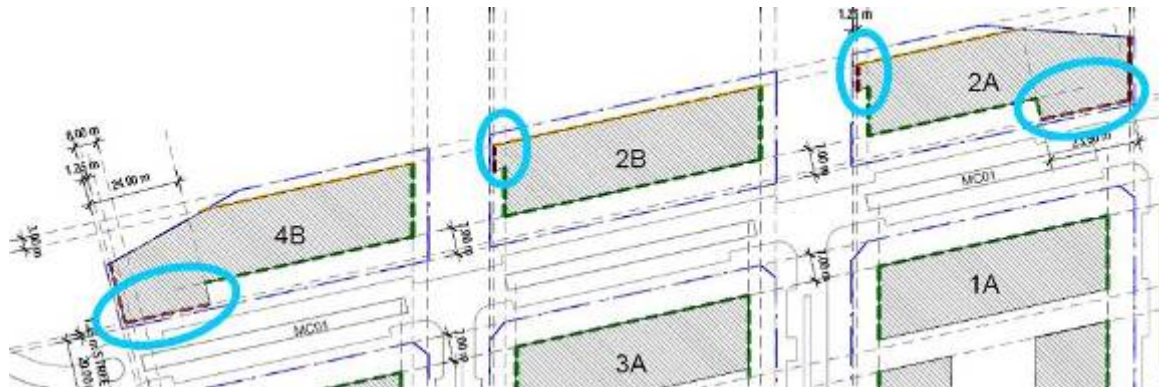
Locations where upper level setbacks were required by the Stage 1 DA.
